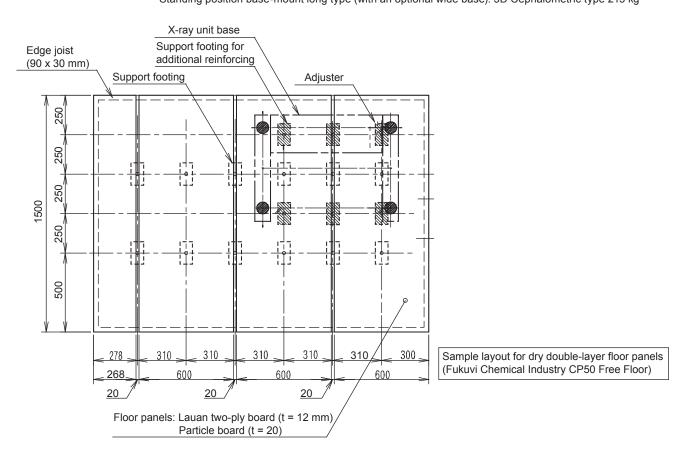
Sample layout for dry double-layer floor panels (wide base-mounted)
